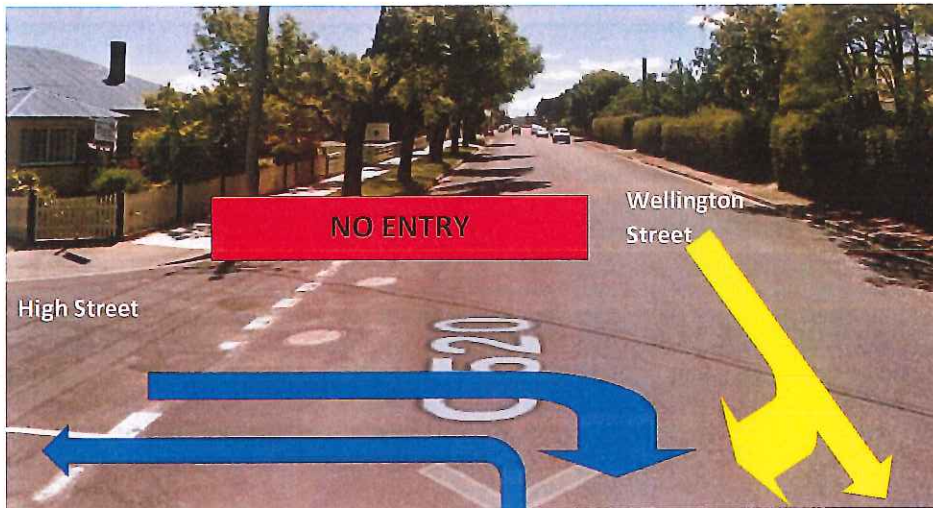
Concept of the No Entry into Wellington Street south at High Street
